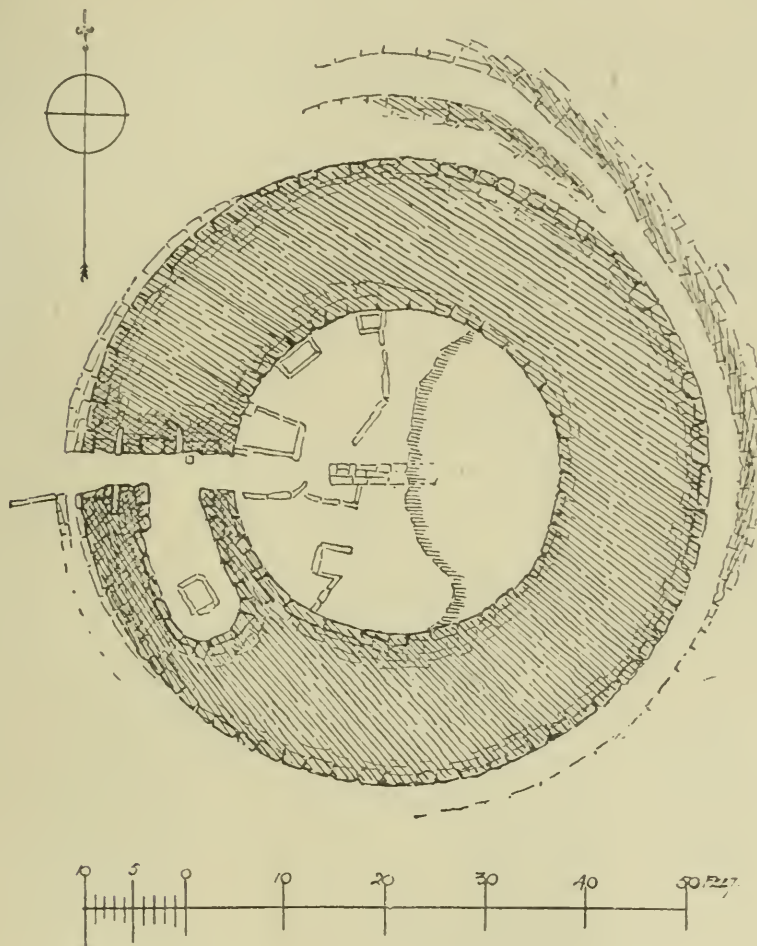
Broch, Kilmster (No. 507); Ground-plan.
